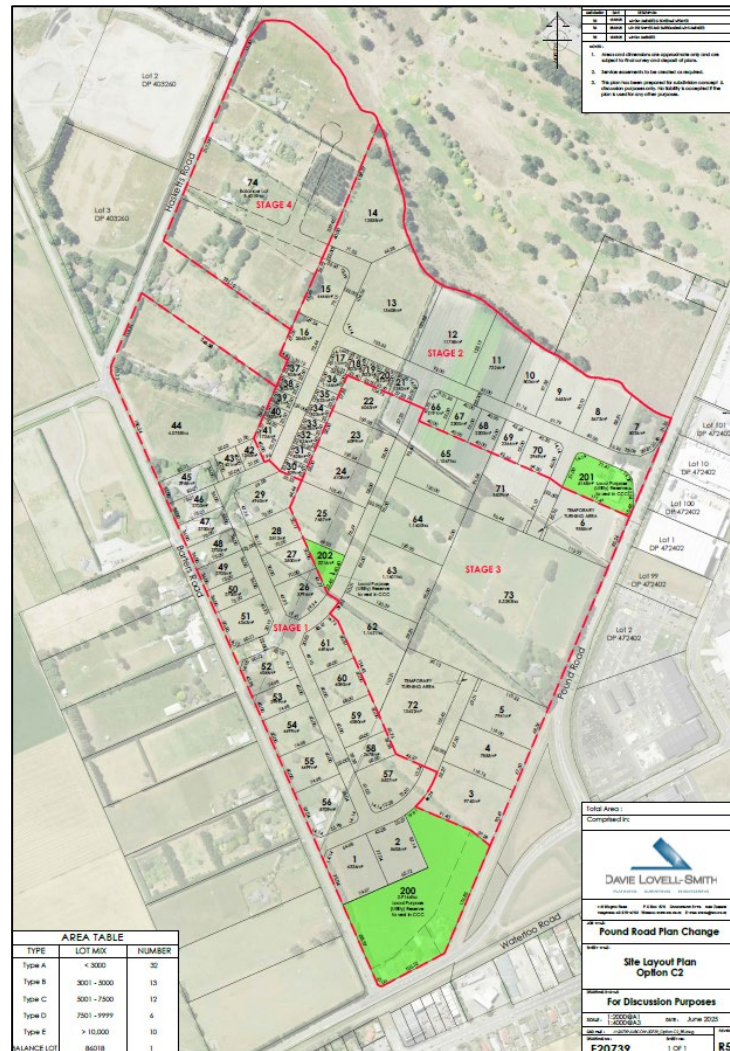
Proposed subdivision plan (Source: Davie Lovell Smith)
